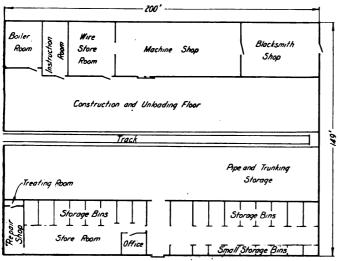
Plan of Shops, Assembling and Shipping Floors, and Store Rooms.
